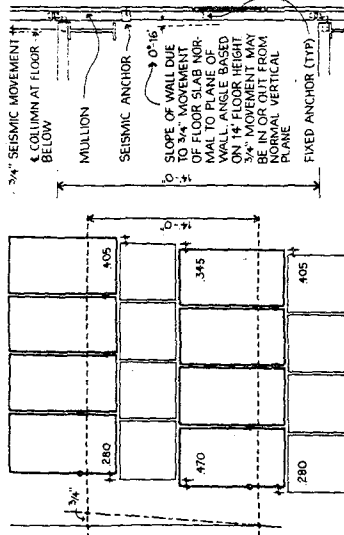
ELEVATION SHOWING LOCATION OF CURTAIN WALL CONNECTIONS AS DESIGNED BY SUBCONTRACTOR.
